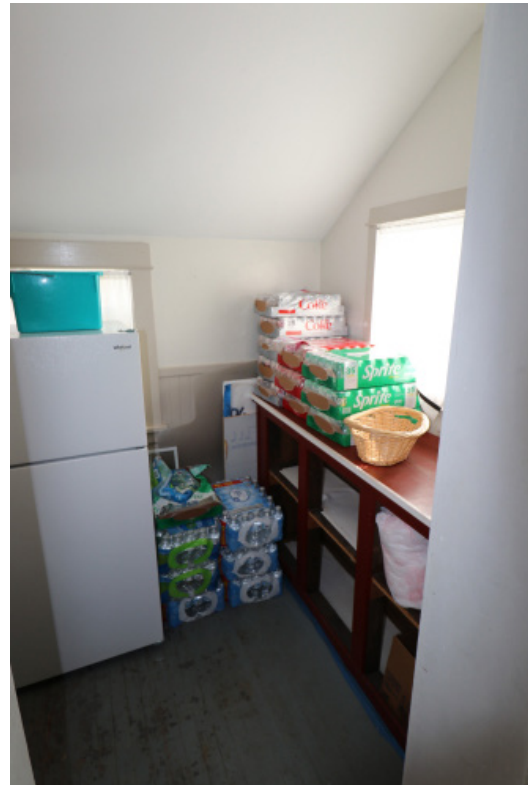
D-146 Enclosed Porch on the north elevation, not in use.
